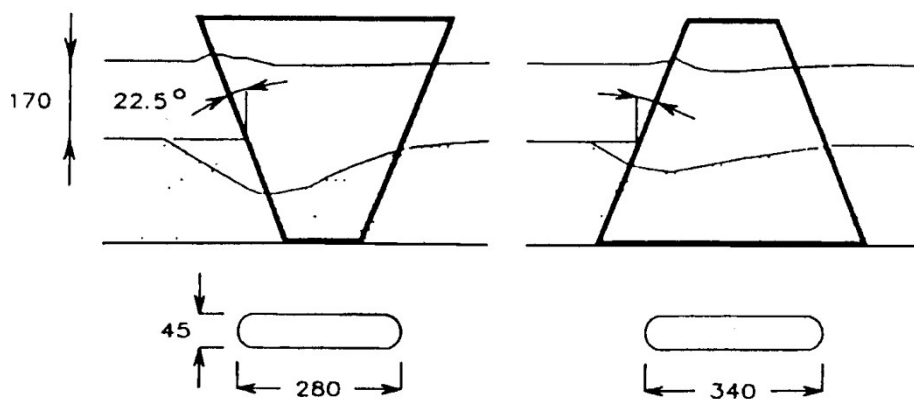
Scour at piers tapered in elevation. Dimensions are at original bed level (after Raudkivi, 1998).
